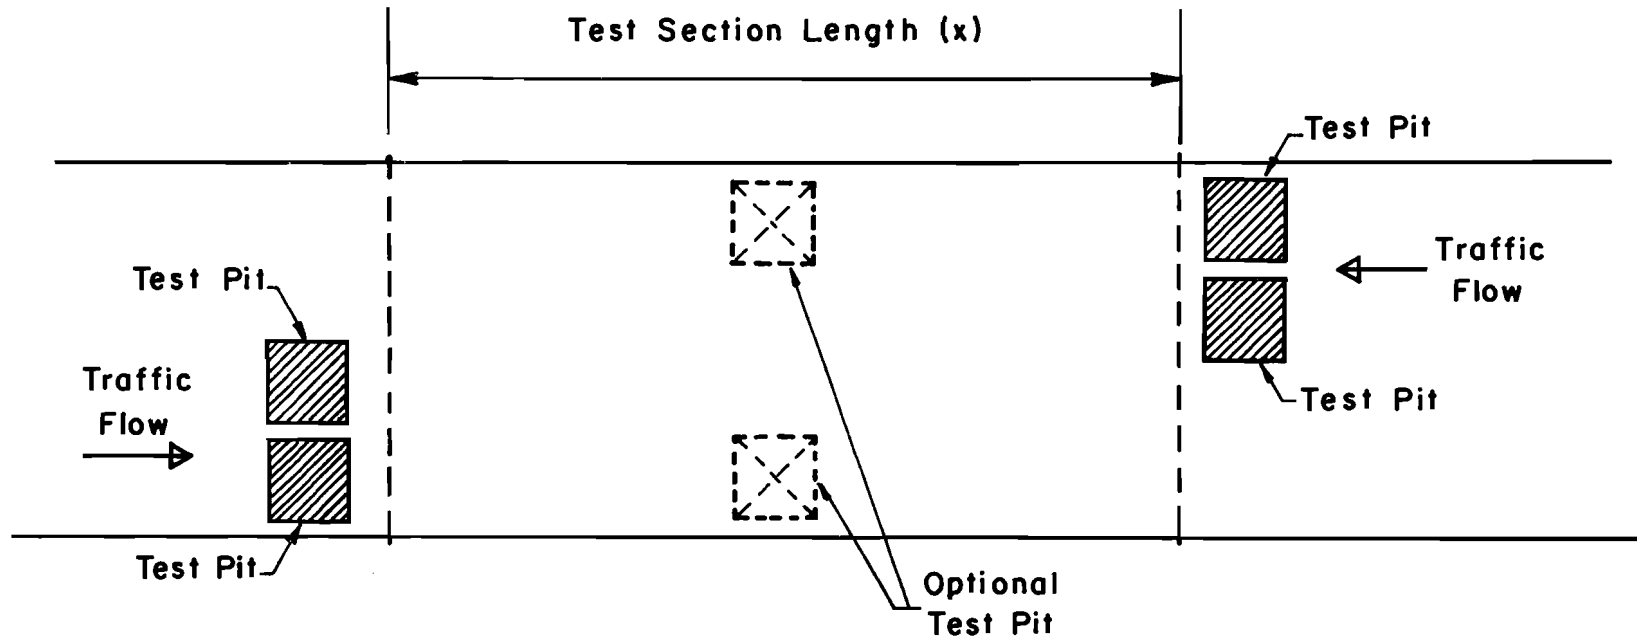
Test section layout considering four test pits for layer thickness measurements.
